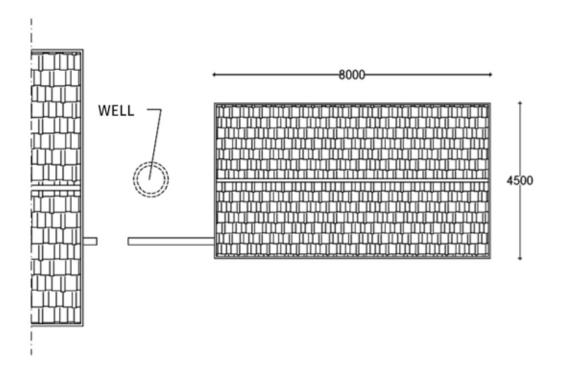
The Existing Plan of Muhammadiyah Vocational High School
